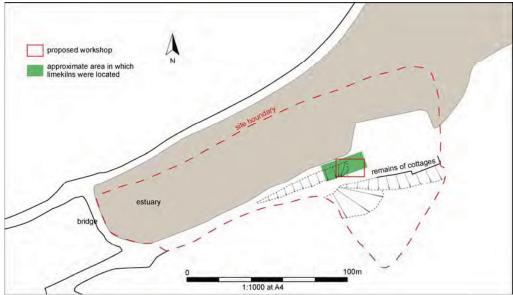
Trace from the architect's site plan showing approximately the relationship of the proposed new building to the location of the former lime kilns.
